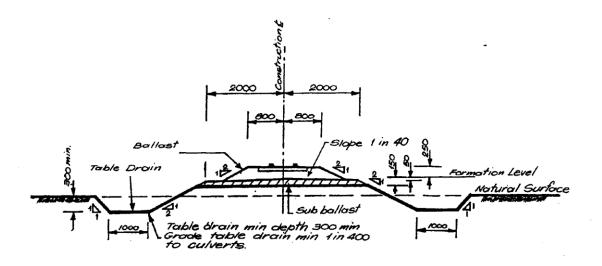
Typical Surface Formation (1 200 mm Concrete Sleepers)
